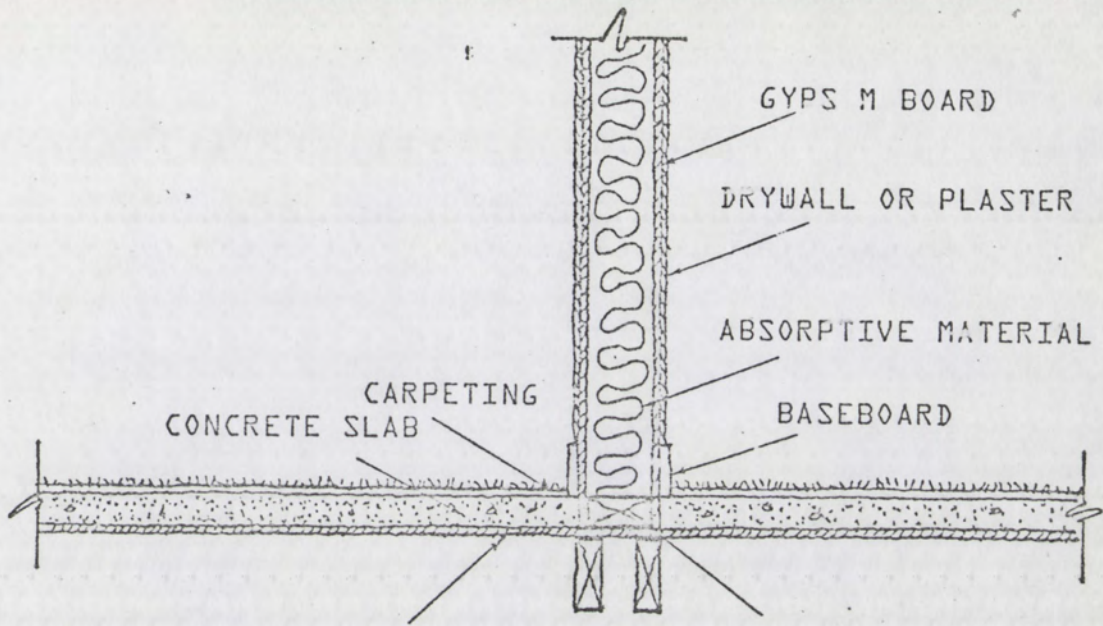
Staggered Studs - Alternate Electrical Elements
